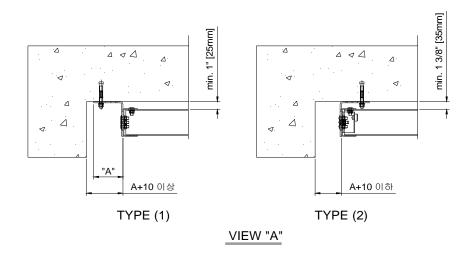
STRUT AND HEADER FRAME ASSEMBLY (SS)
